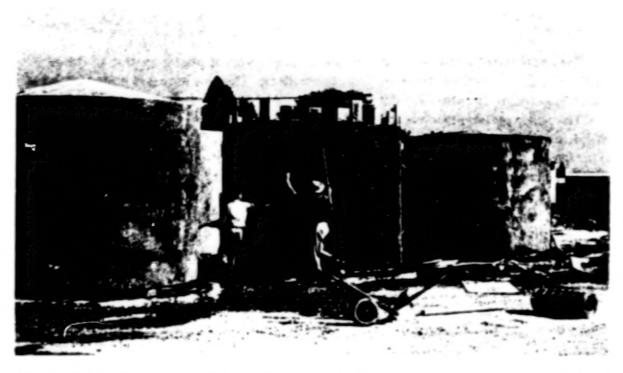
Ferrocement 5,000-gallon water tanks under construction in New Zealand.
